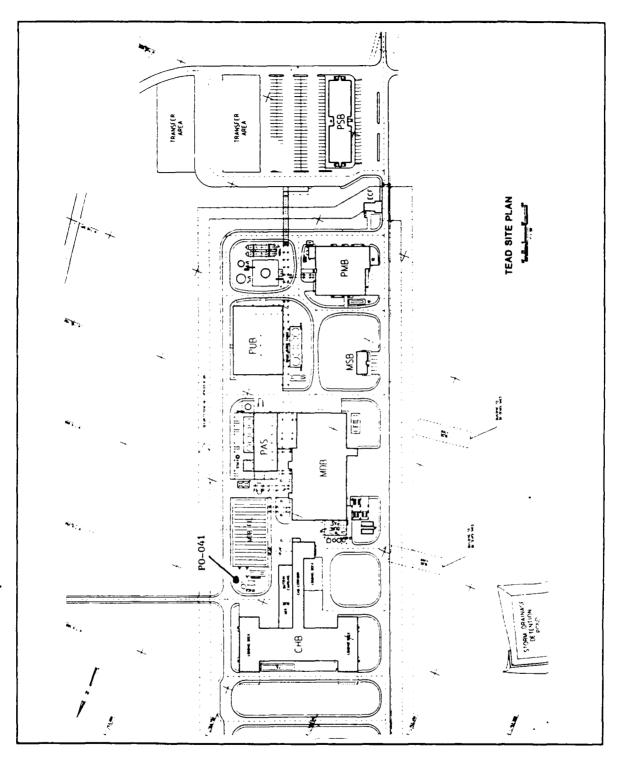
TEAD CSDP Disposal Facility Site Plan (PO-041 Release Point)
